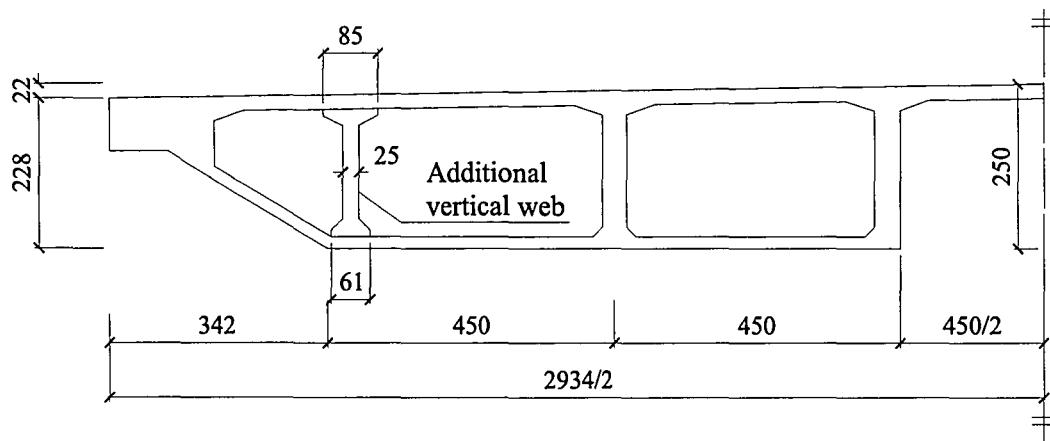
Cross-section of retrofit vertical web in the 49.5-m span (Unit: cm)
